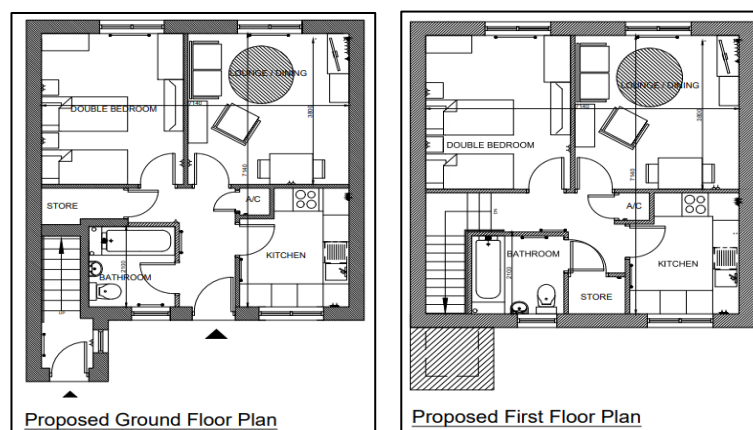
Ground and First Floor Plan – Blocks 7, 9 and 12
